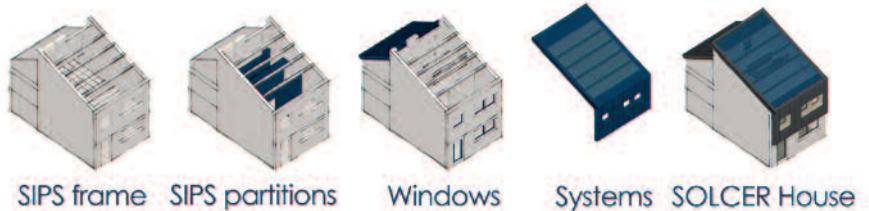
SOLCER house with PV roof and battery storage, constructed from SIPS panels.
